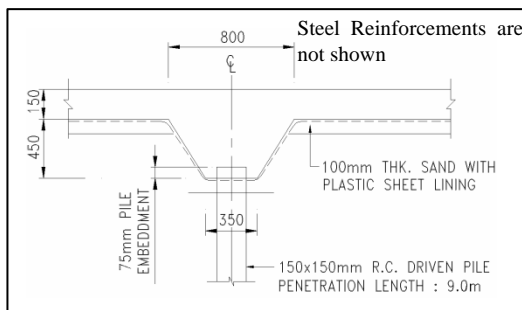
Cross-section of strip raft foundation system for link houses (Tan, et al., 2004 (b)).
